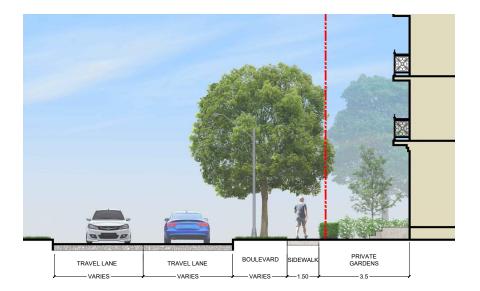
Saw Whet Boulevard Streetscape Cross-Section
